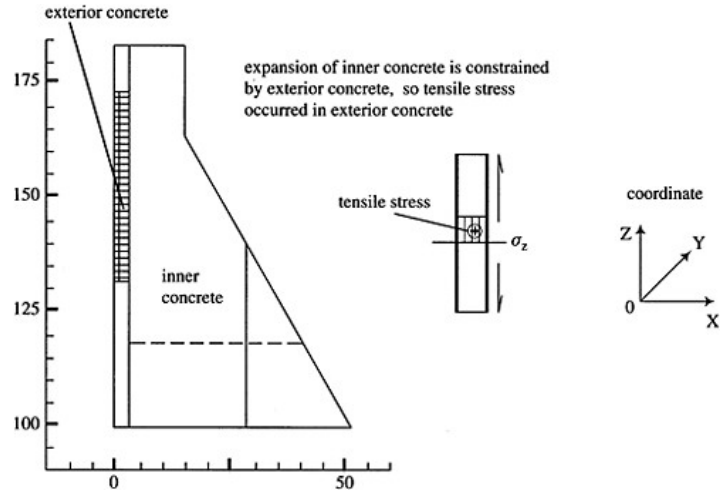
Tensile stresses occurred in exterior concrete in actual construction.
